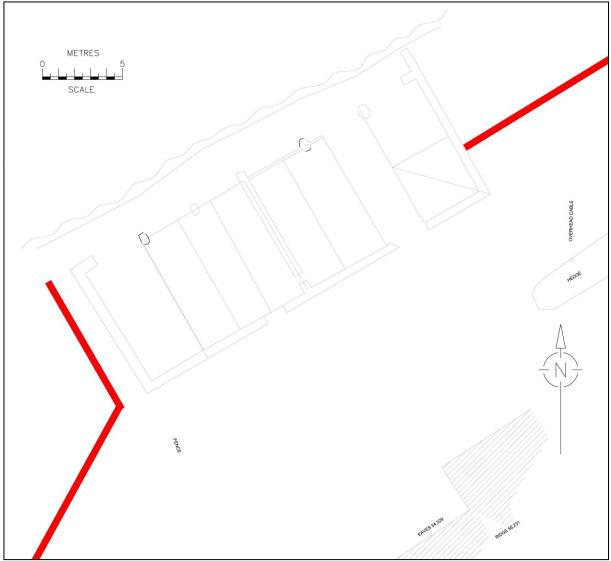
Site plan indicating the location of the trenches, depicted in red.
